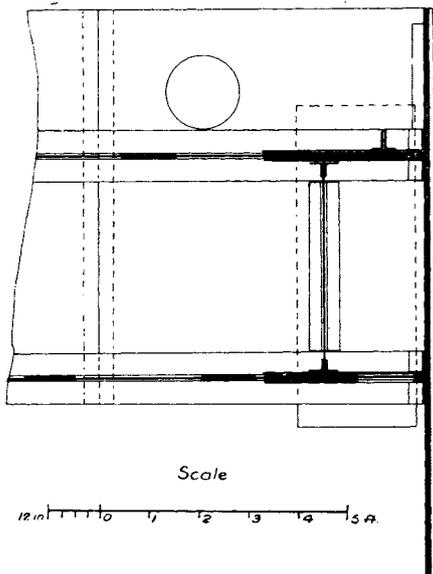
UNDERGROUND RAILWAY, BOSTON, U.S.A.
